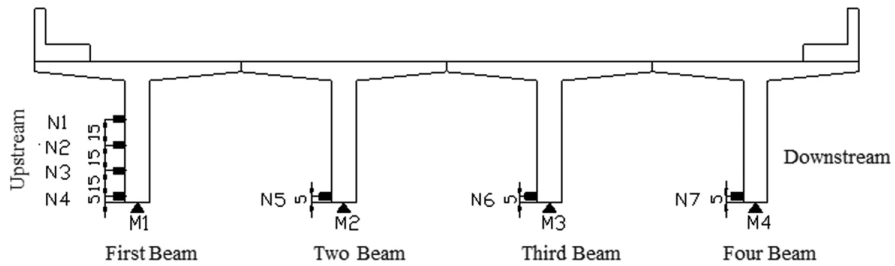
Layout of measurement points on the cross-section at mid-span of the test span
